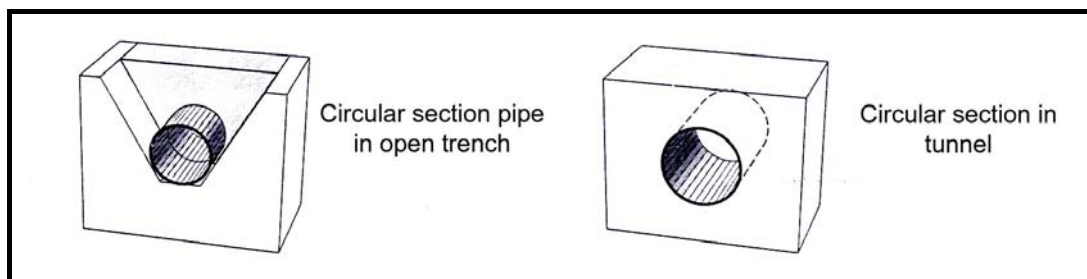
End Use Configurations of Utility Pipes or Tunnels (Source: Sterling, 1993).
